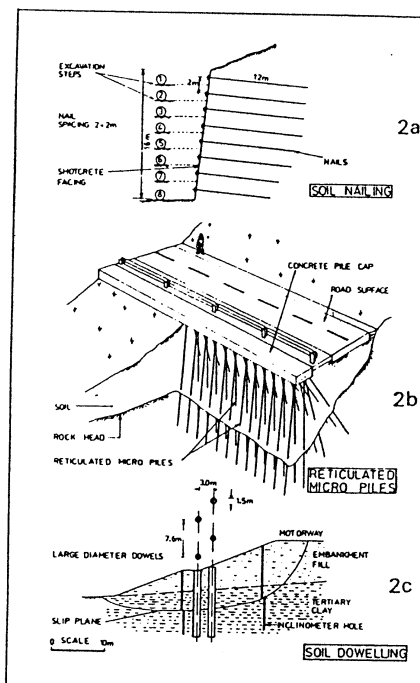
The family of insitu soil reinforcement techniques (a) soil nailing (after Schlosser, 1982) (b) reticulated micro piling (after Boley and Crayne, 1985) and (c) soil dowelling (after Gudehus and Schwarz, 1984)
